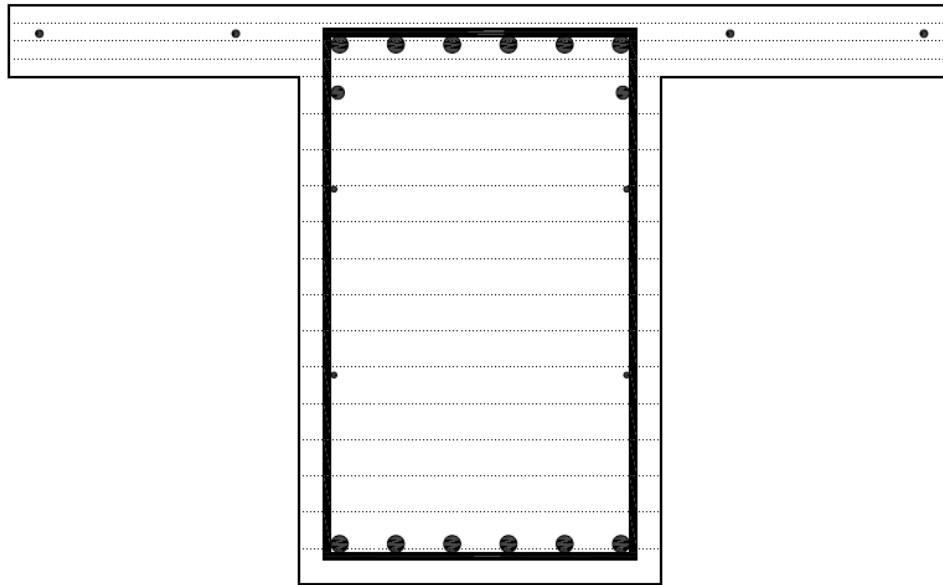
Cross Section for Specimen 1 at Element 1.
